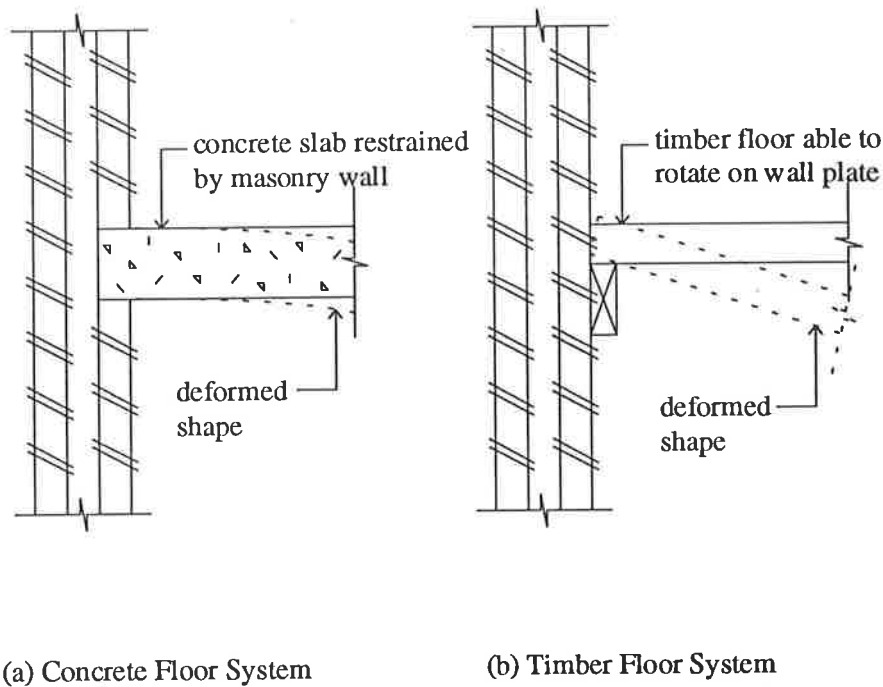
Concrete and Timber Floor System Connections to Walls.
